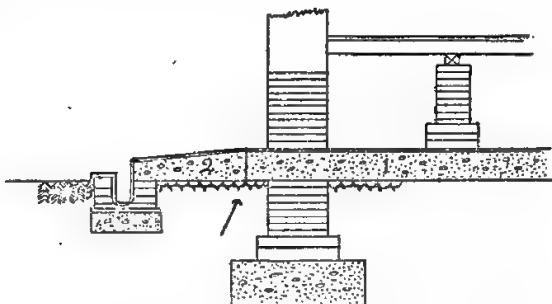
Detail of termite-proof construction; a layer of cement at ground level laid in two parts.
